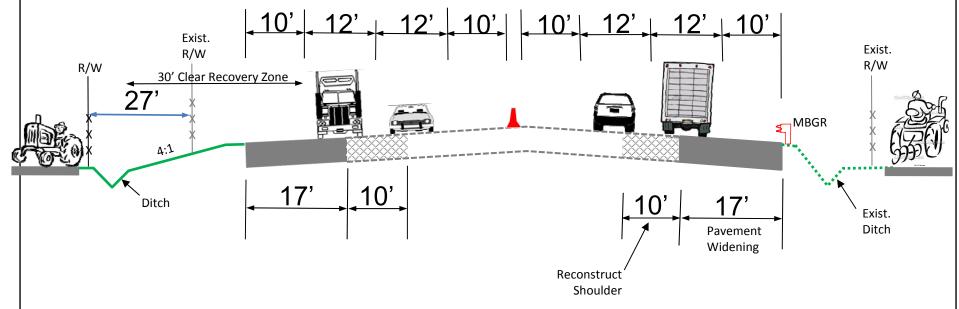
Typical Cross Section of Alternatives 1 and 2 Divided Highway (Route 156 to Grant Line Road)
